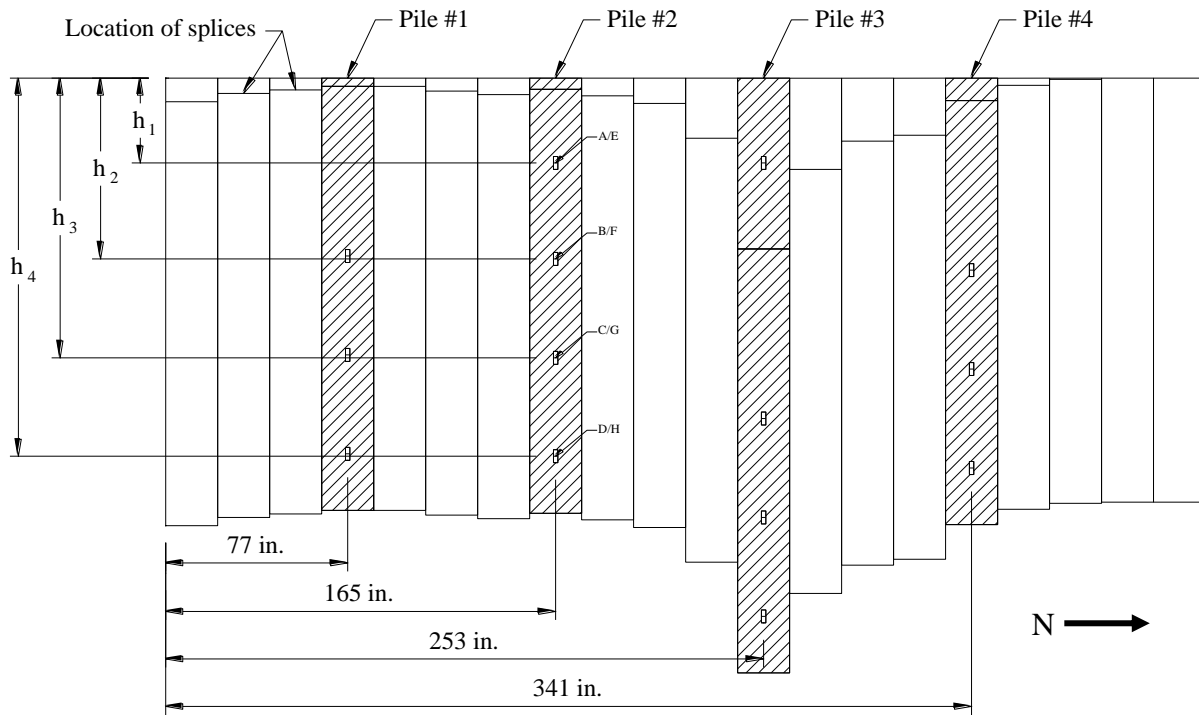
Profile of sheet pile wall showing locations of pile strain gages
